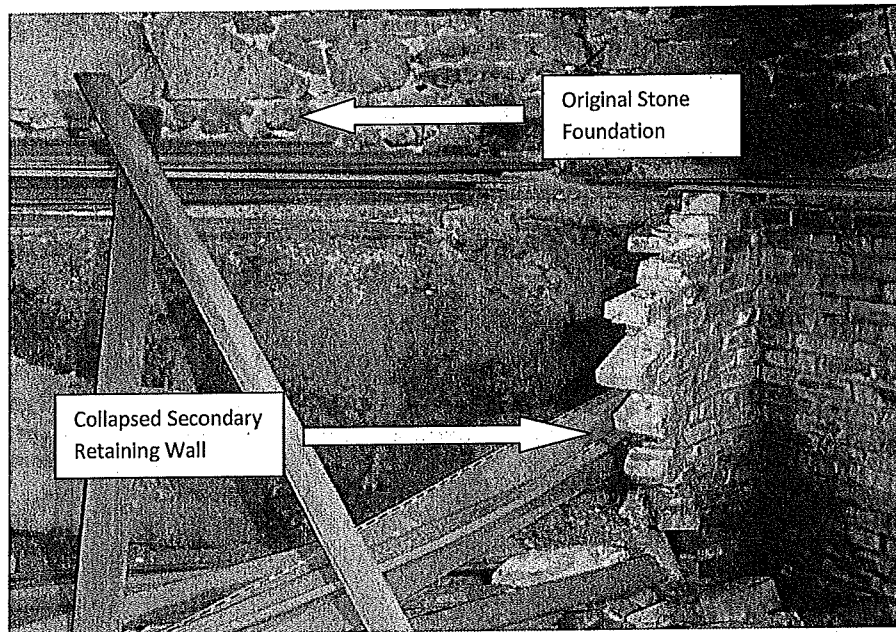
Northeast Corner of Foundation with Collapsed Secondary Retaining Wall
